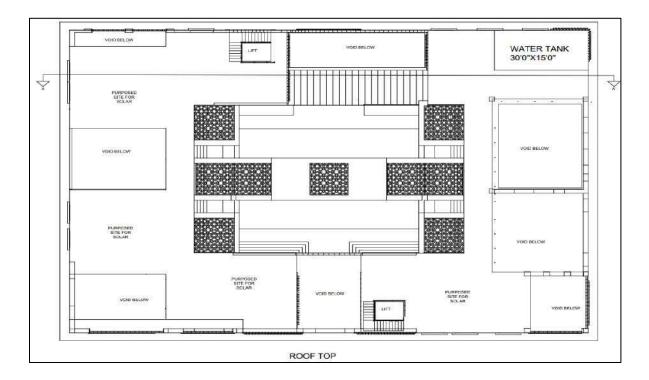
University building top view - Roof top (AutoCad 2022)
